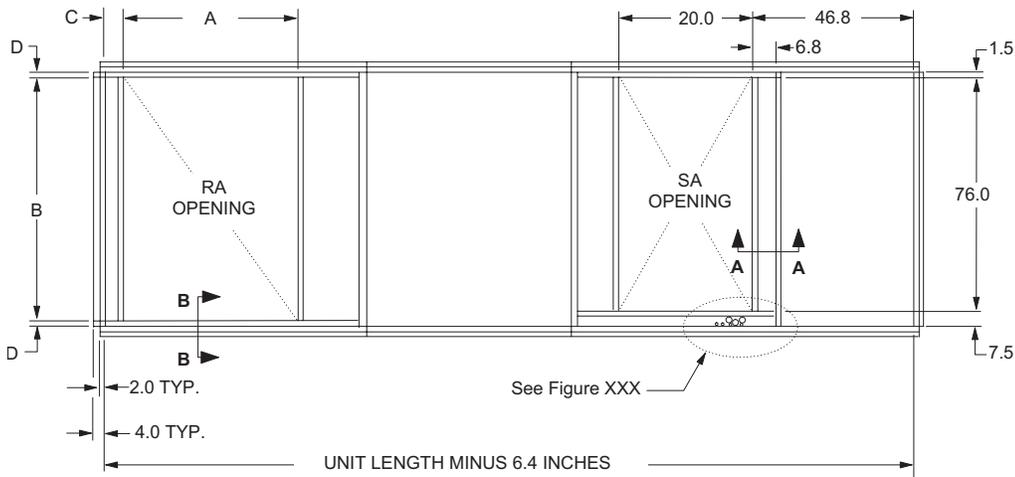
Roof Curb without Blank Compartment (Out of Airstream)
